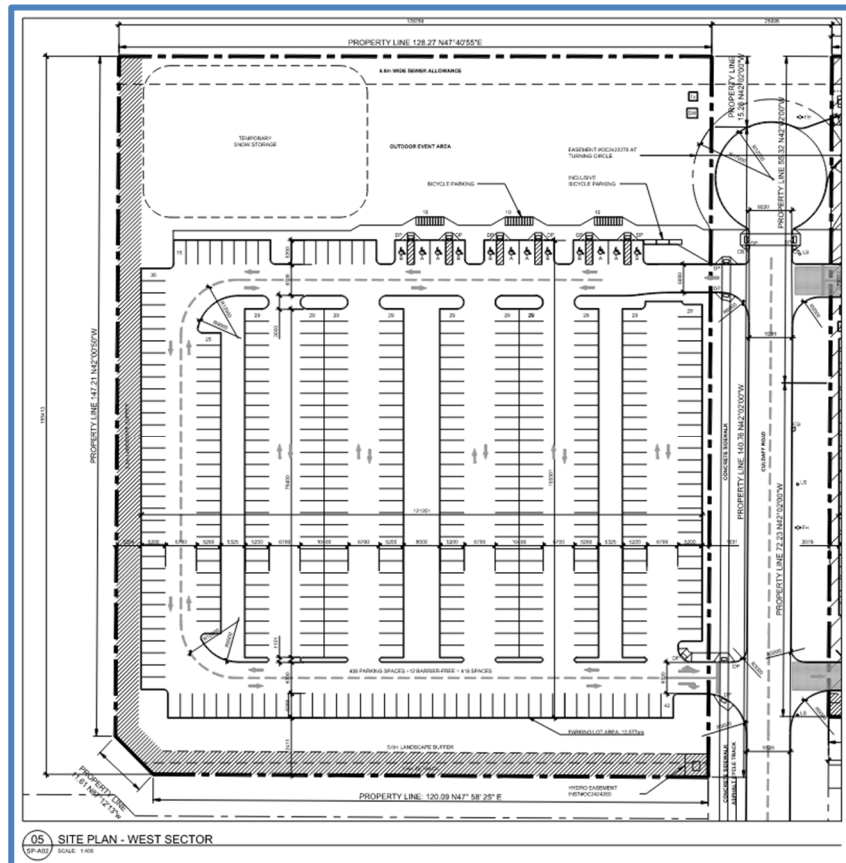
Site Plan - West (Unaddressed Property on Cudaff Road)
